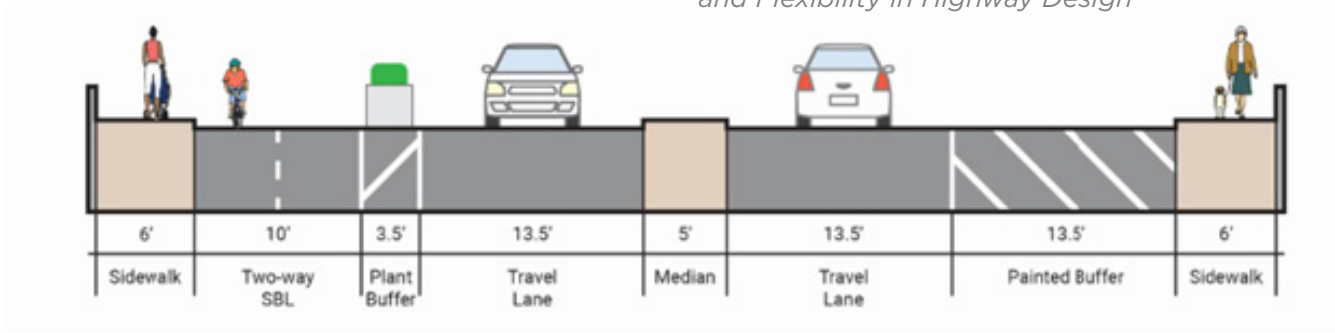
Clifton Boulevard Bridge Build Configuration
